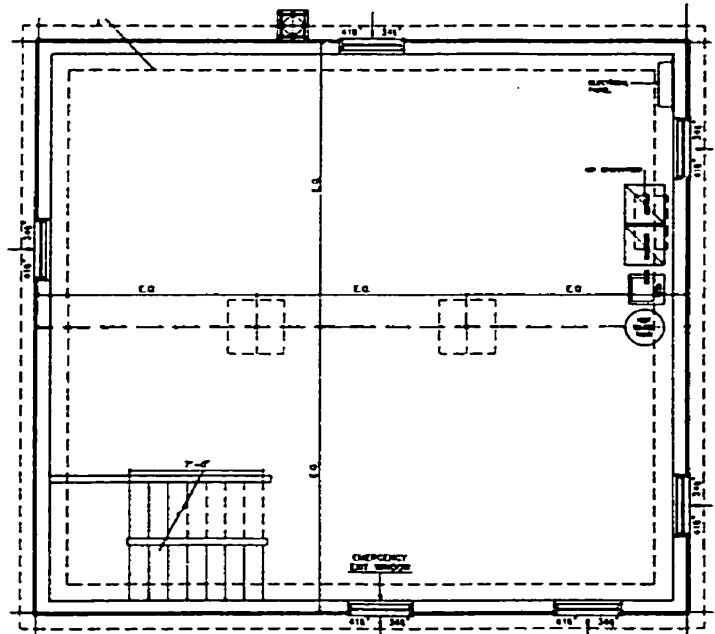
Basement, original layout (Inuit house, 1996)
